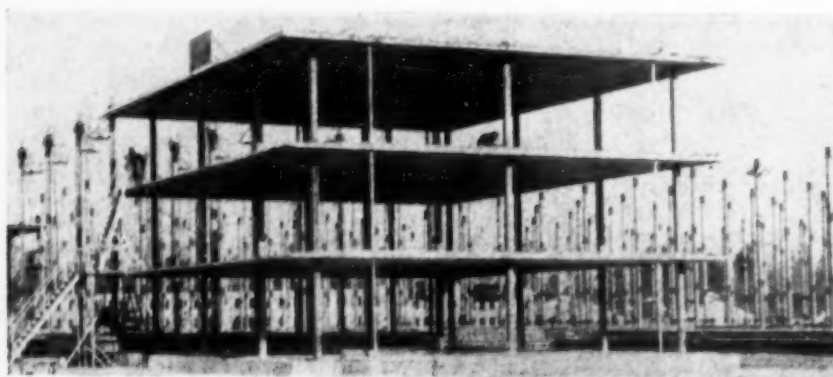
Floors Cast at Ground Level and Hoisted into Position.
